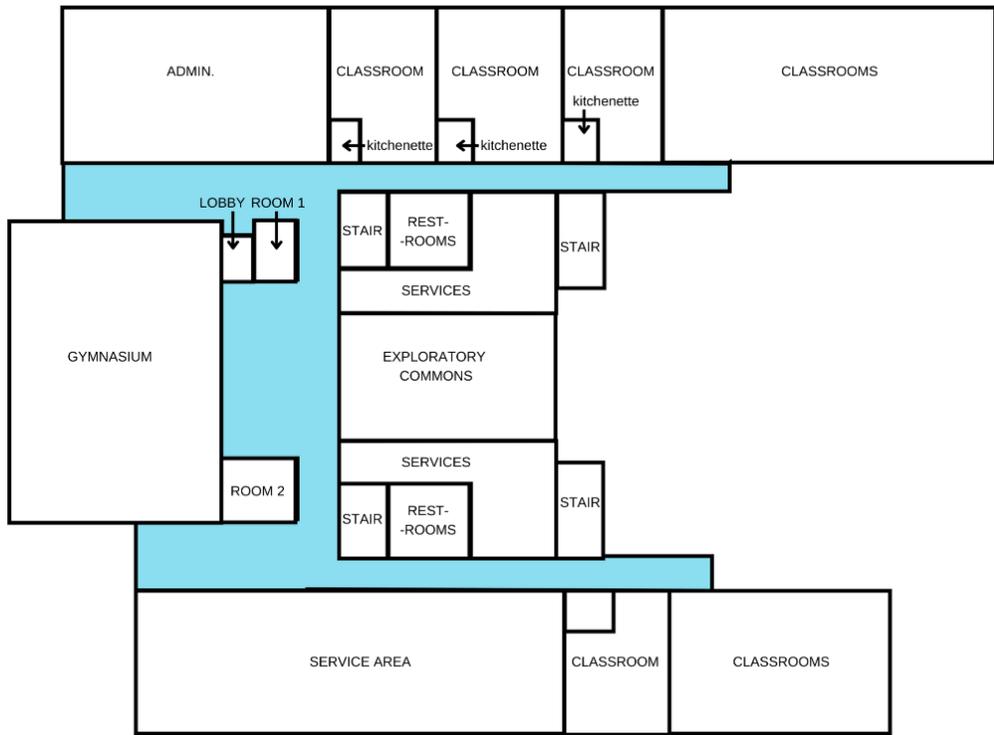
Browns Point Elementary School Building Layout Graphical Representation – 1st Floor (By: Author)
